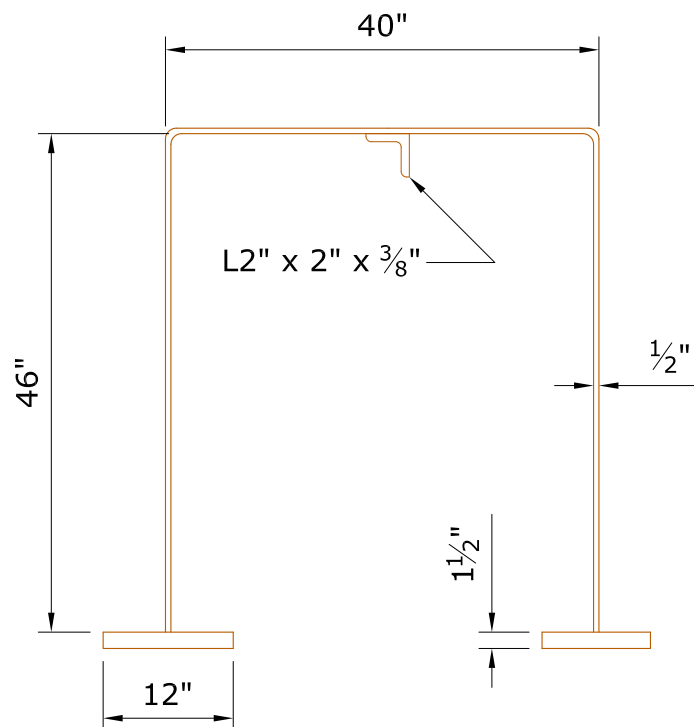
Dimensions of Box Girder for 105' Span Bridge
